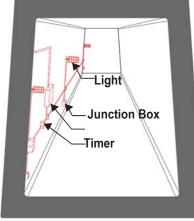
MAINTAINABILITY BRIDGE BOX GIRDERS SIGNATURE BRIDGE MAINTENANCE SIGNATURE BRIDGE BOX GIRDERS MAINTENANCE LIGHT SIGNATURE BRIDGE ACCESS AND HATCH Access Hatch Timer Switch Junction Box Receptacle Ladder Health Monitor System on the Arch Cable Stayed Bridge SEGMENTAL BRIDGE BOX GIRDERS MAINTENANCE LIGHT Junction Box-Timer Corrosion Protection Strand System to Reduce Maintenance Need for Cables VIADUCT ACCESS SIGNATURE BRIDGE ACCESS AND HATCH
